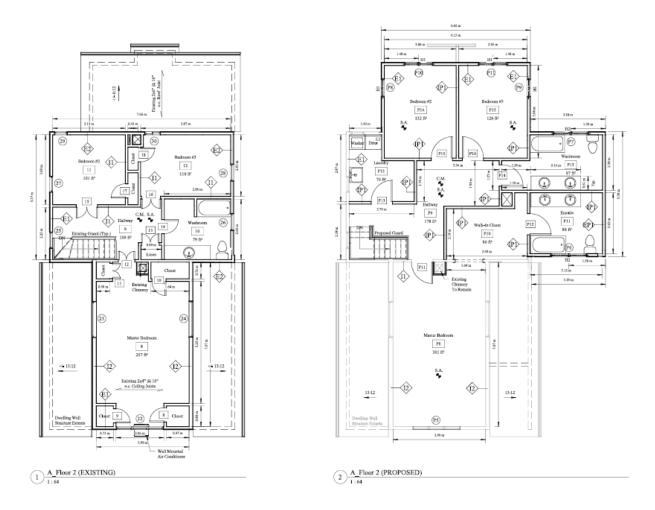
Existing and proposed second floor plans, 869 Sangster Avenue. (Images from owners.)
